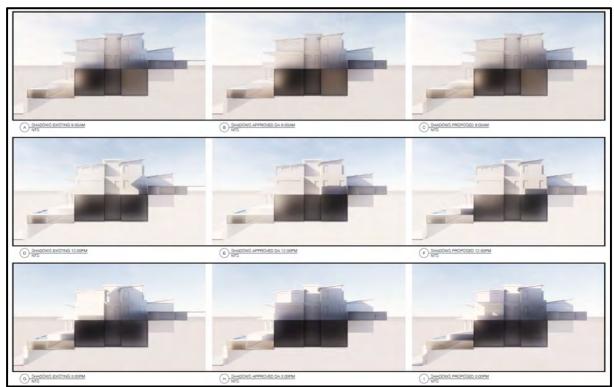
Extract of the elevation shadow plan demonstrating that the proposed development will result in less overshowing to 42 Bower Street, which adjoins the subject site to the east, compared to the recently approved development
